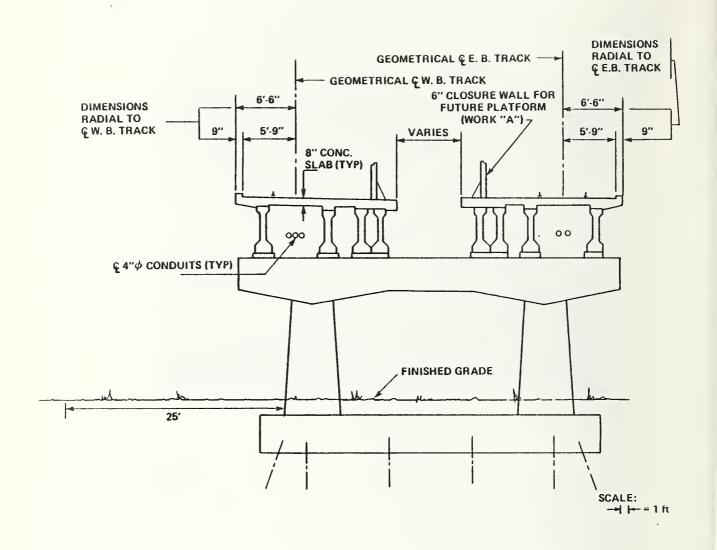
PATCO ELEVATED TRANSIT STRUCTURE CROSS-SECTION AT WESTMONT PIER NO. 17
